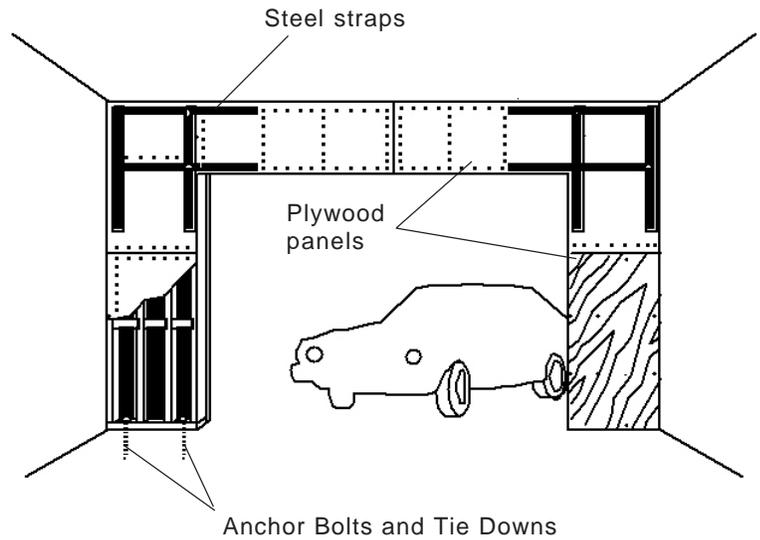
Bracing garage walls. If your house has a room over the garage, the garage walls may not be strong enough to hold up during an earthquake unless they are braced with plywood panels and steel straps.
